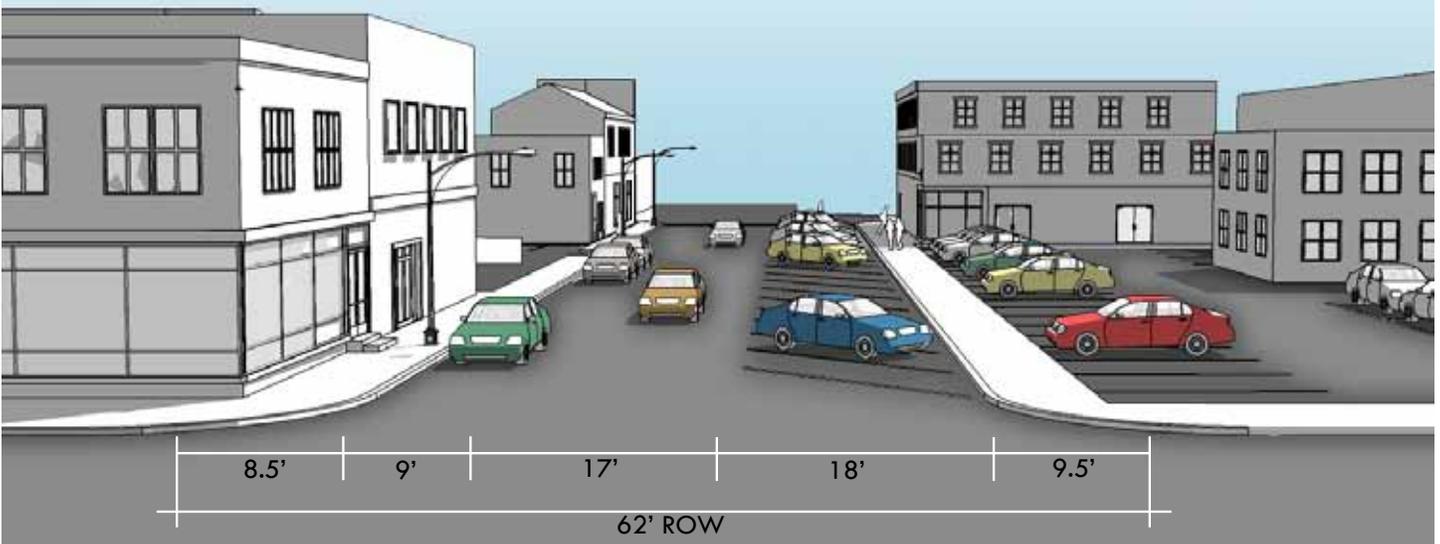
Illustration of an Existing Street to be Retrofitted to a Multimodal Corridor.
